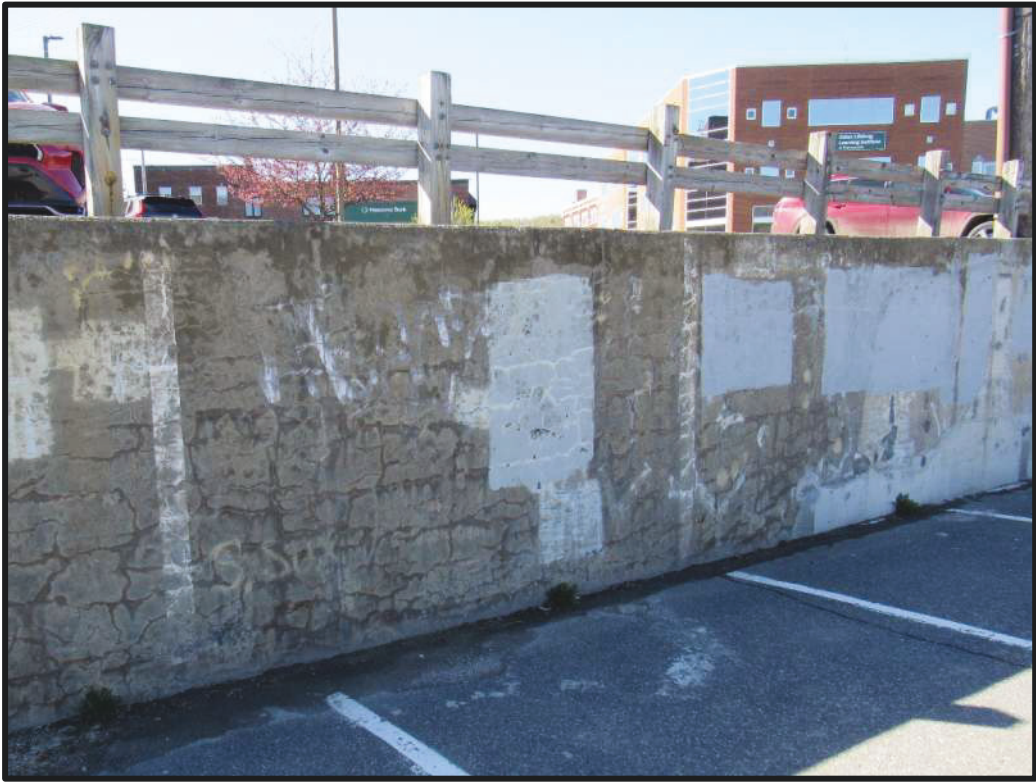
Map Cracking and Efflorescence on Wall Segment #2
